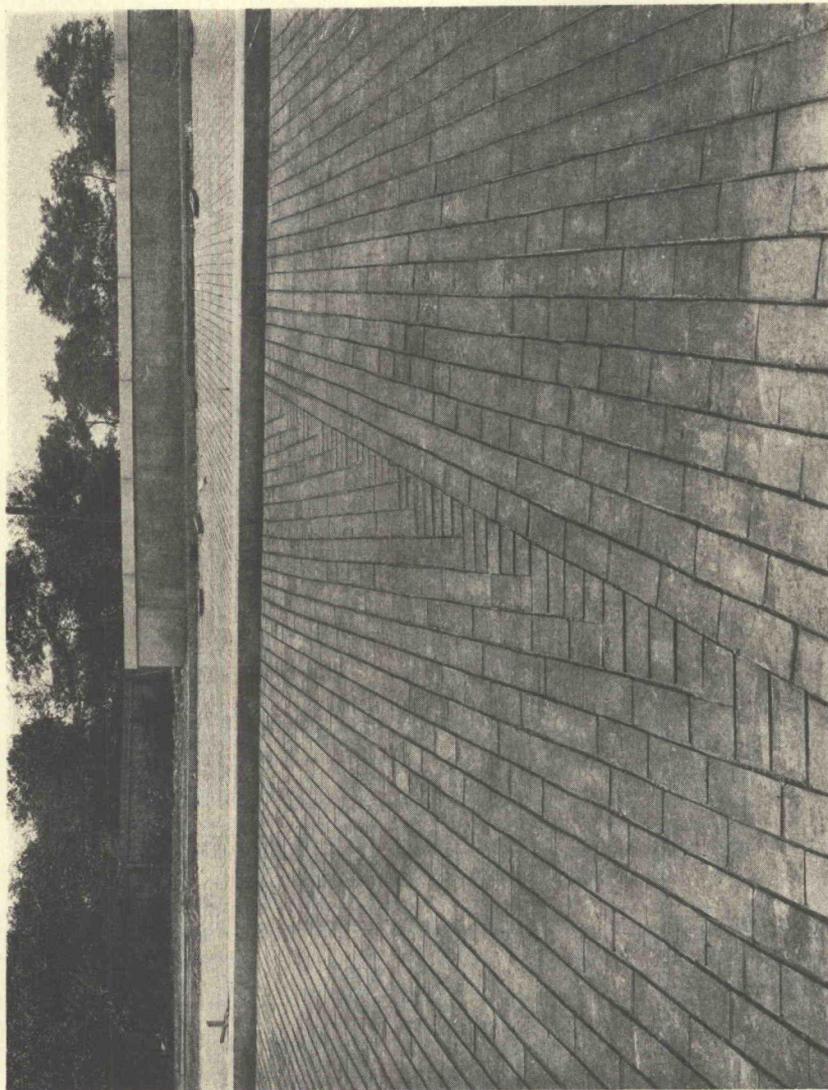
Close Up of Asphalt Block Pavement Showing Joint Construction for Non-skid Surface
